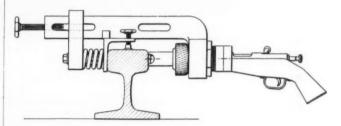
This tool harnesses "gun power" to drive stud terminals firmly into holes in steel rails
